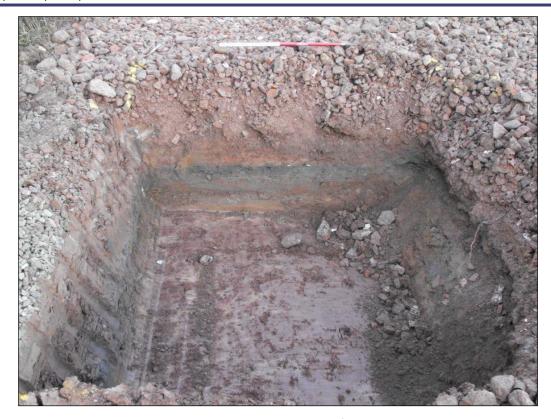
Foundation pad in the south-west corner of the development, scale 1m
